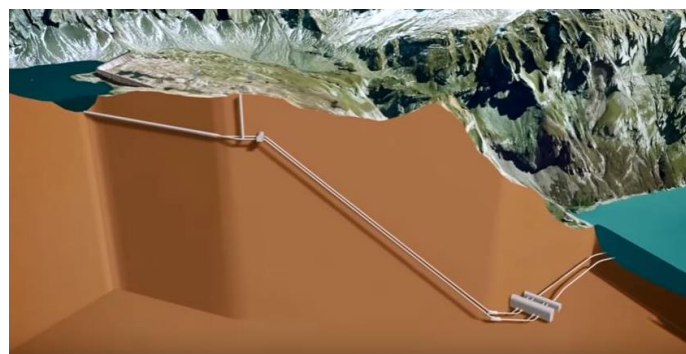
Pumped Storage Hydropower with two reservoirs at different elevations and an underground Pump Turbine Plant
